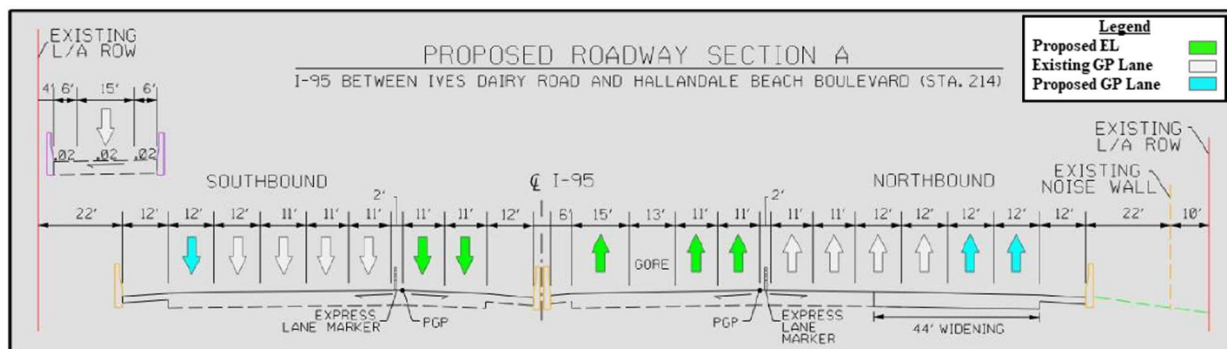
I-95 Roadway Section A – between County Line and Hallandale Beach Blvd
